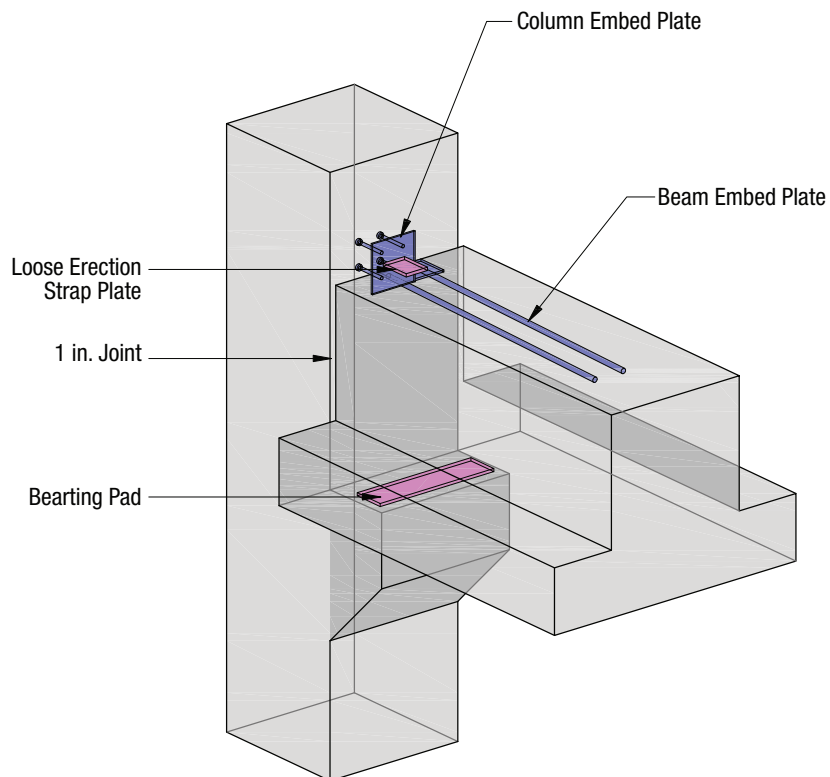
Inverted Tee Beam to Column with Corbel for Bearing and Top Welded Connection
